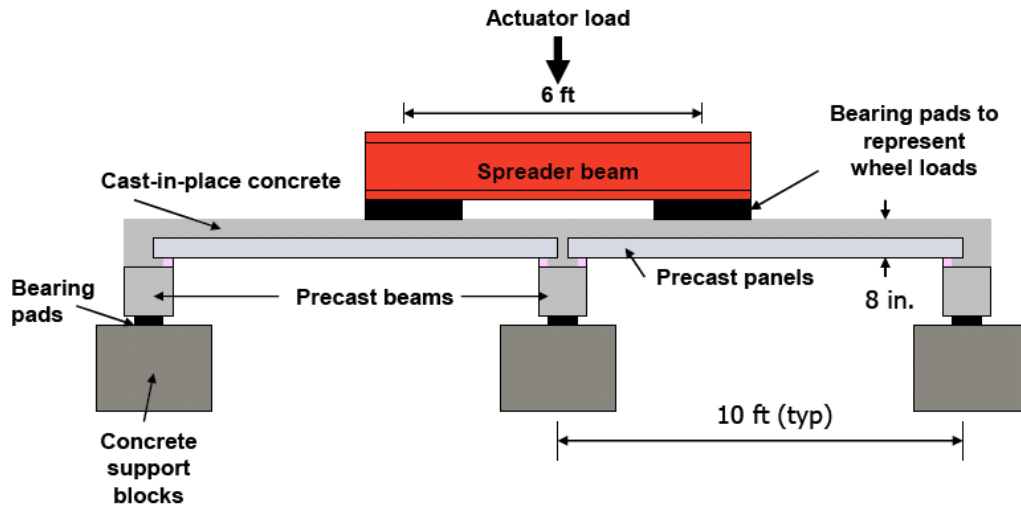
Elevation View of Negative Moment Specimens Subjected to Fatigue Loading (Agnew 2007)
